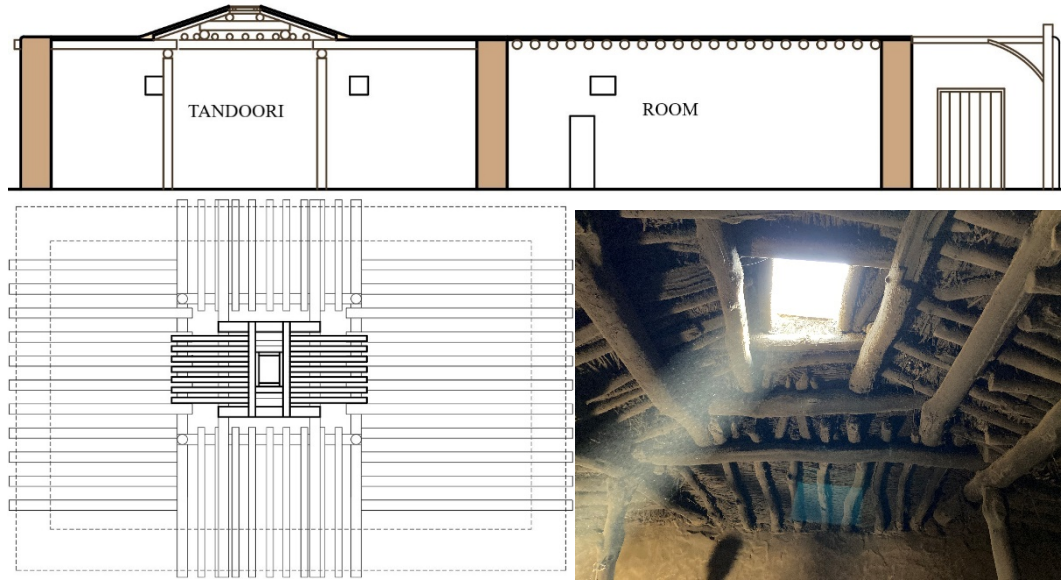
Corbelled roof section, plan and view of tandoori house numbered 3
